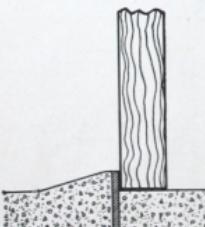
Concrete raised threshold with edge formed by flat steel bar set in concrete.
